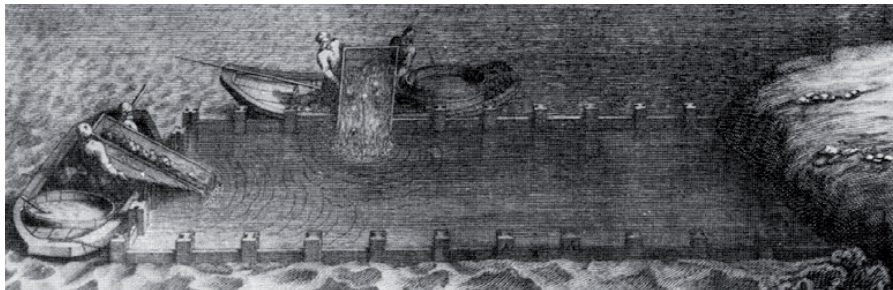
The construction of a mole without dewatering, with concreting under water [Vitruvius 20]
